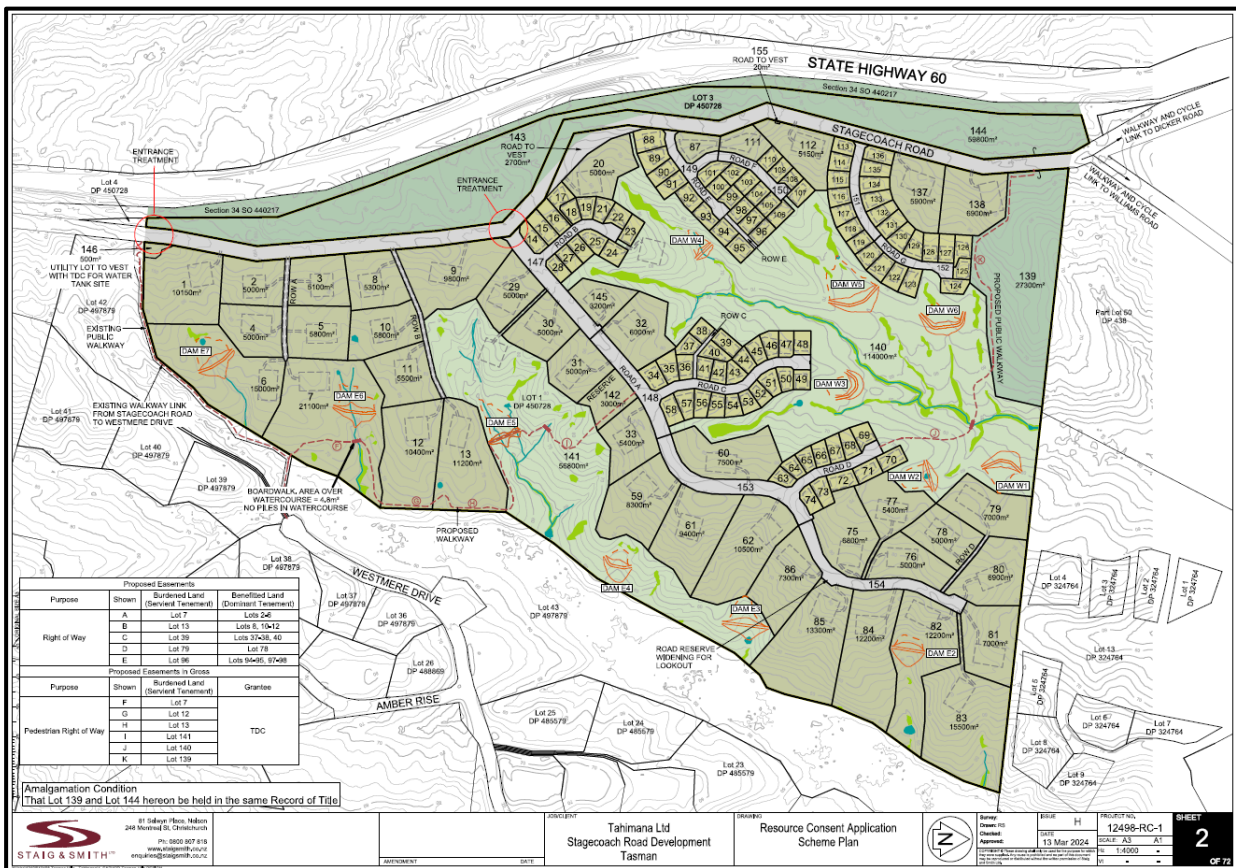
Scheme Layout. (Source: Staig & Smith Plan 12498-RC1 Sheet 2)
